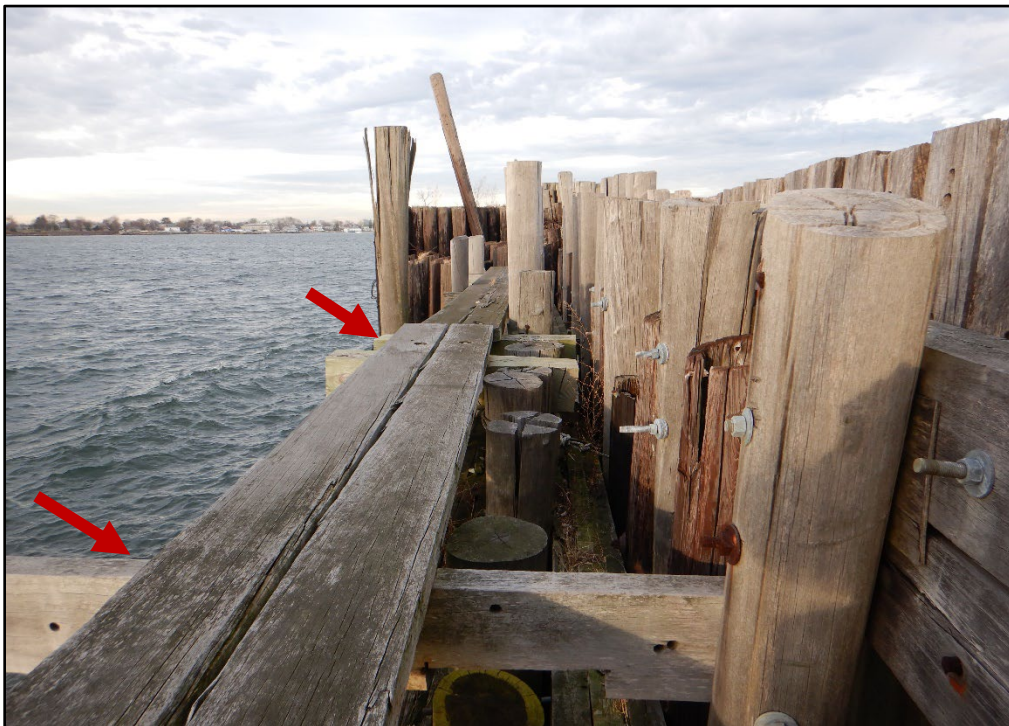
Missing safety railing at the top of the south timber fender rack at Hart Island, looking west.
